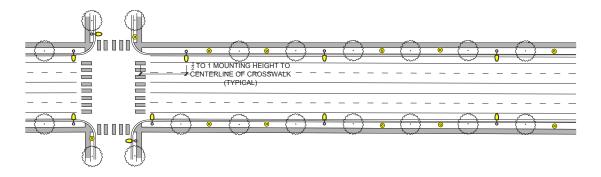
Typical Arterial with Continuous Street and Pedestrian Lighting Plan
